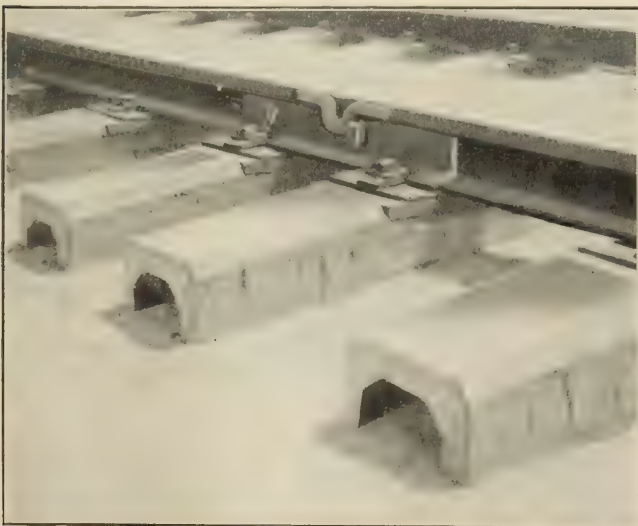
WOLF REINFORCED-CONCRETE TIES IN PLACE
